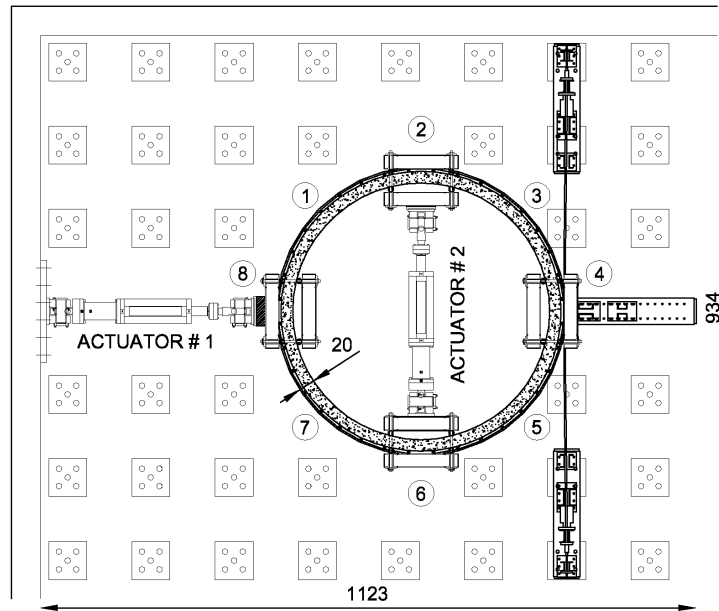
Plan of the tunnel lining TLC1 specimen and loading set-up. Dimensions in cm
